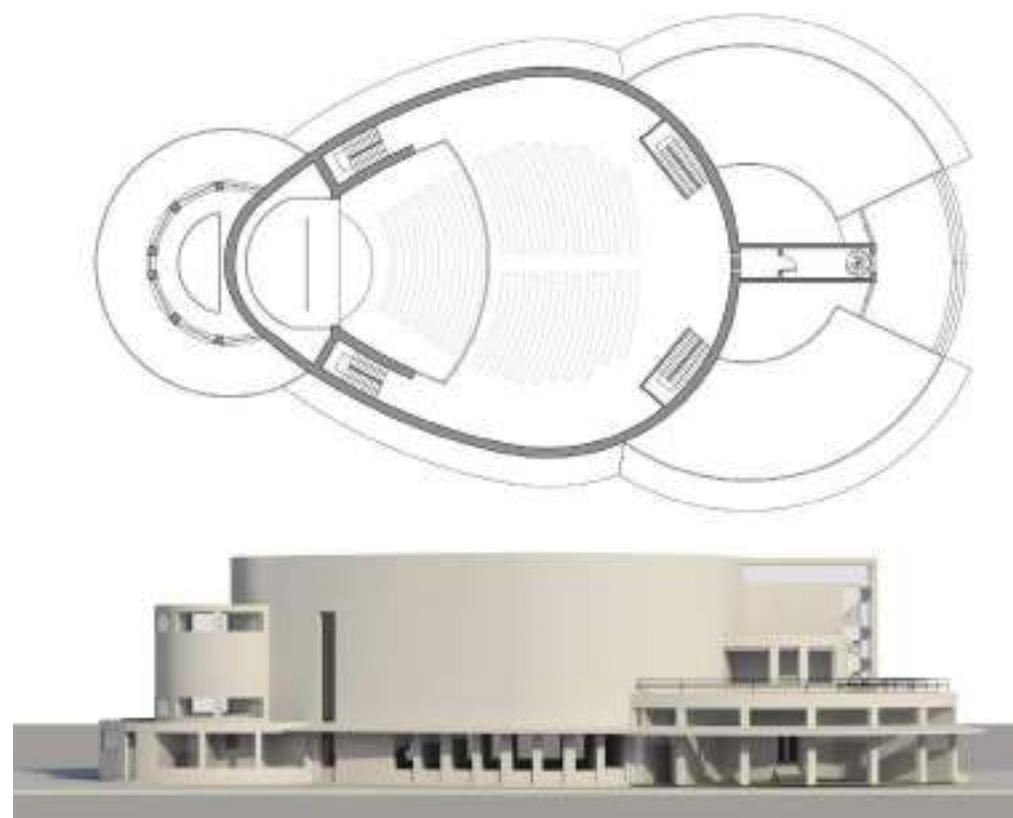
Plan of the first floor and façade from 3D model of the Kina Project
